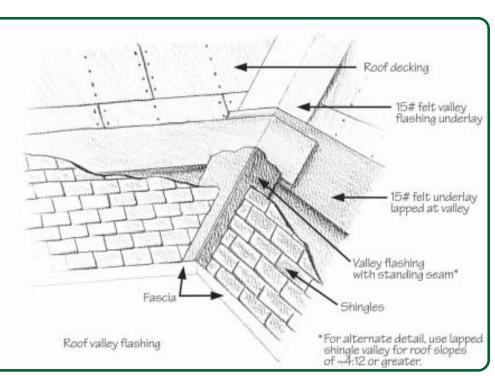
Basic Roof Flashing Illustrations (continued)
